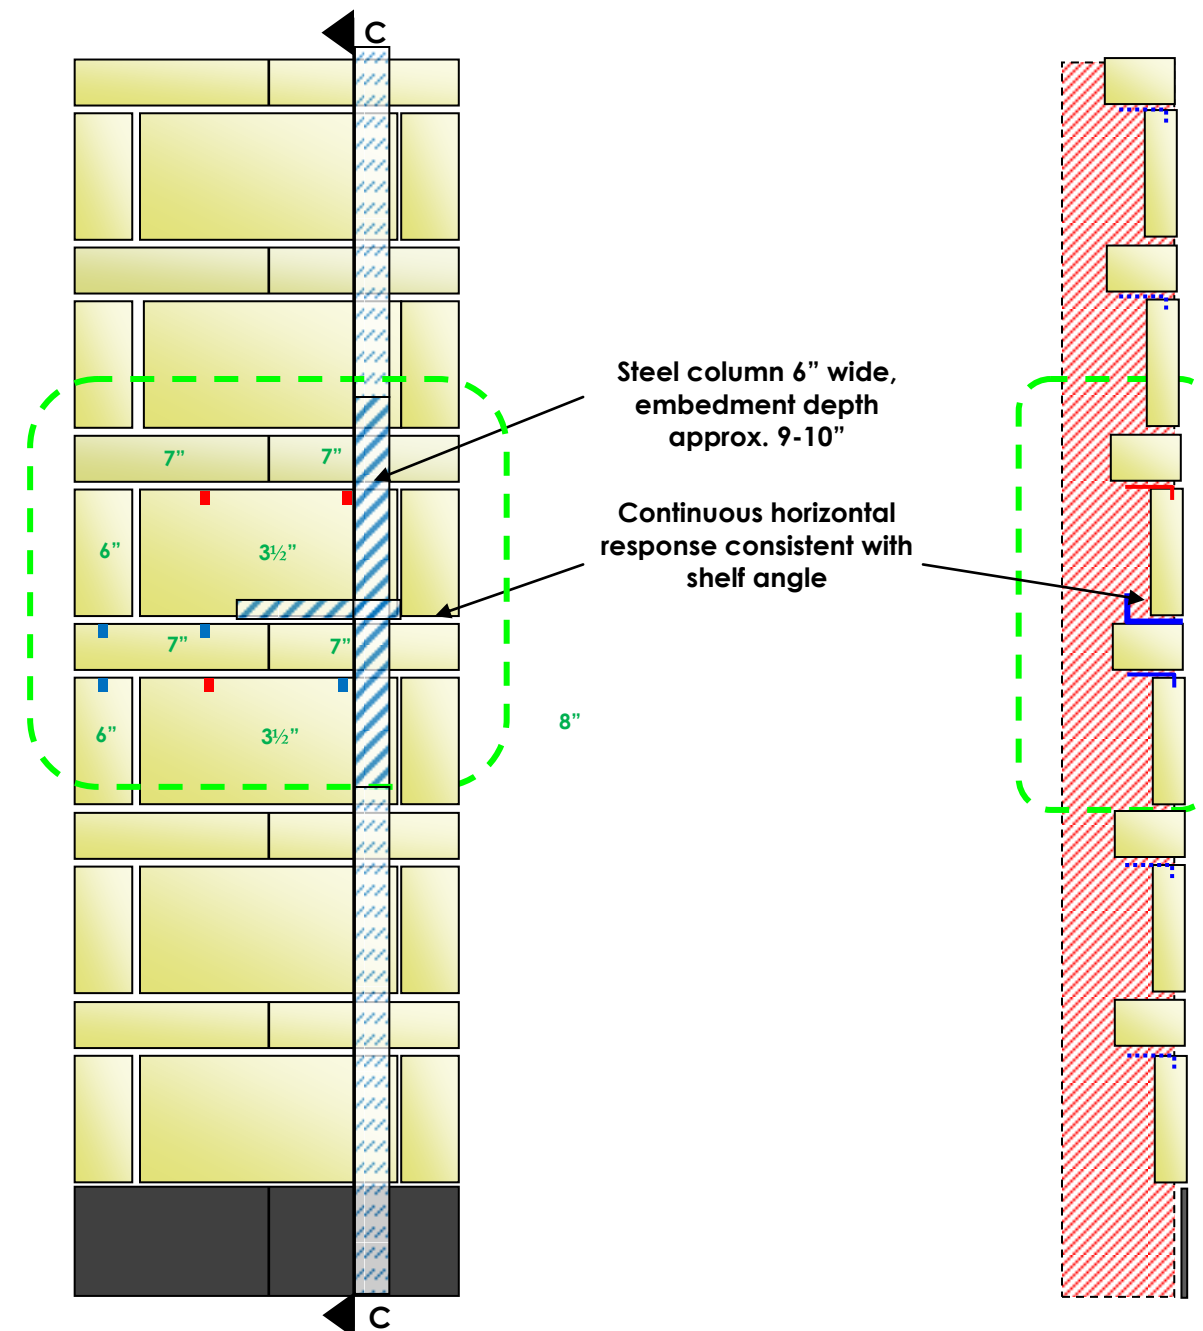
B: SCHEMATIC ELEVATION SHOWING METALLIC INCLUSIONS (ASSUMED ANCHORS, COLUMN AND ANGLE) AND STONE THICKNESSES
